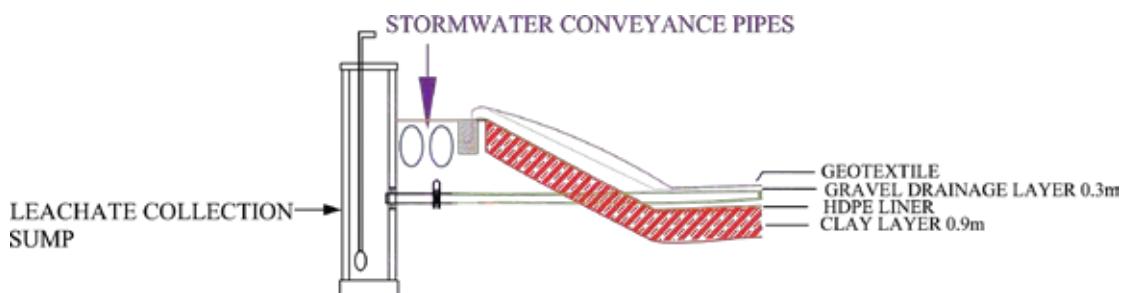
Leachate Collection Pipes are to be connected to a sump, through the liner (in case of below ground landfills)
